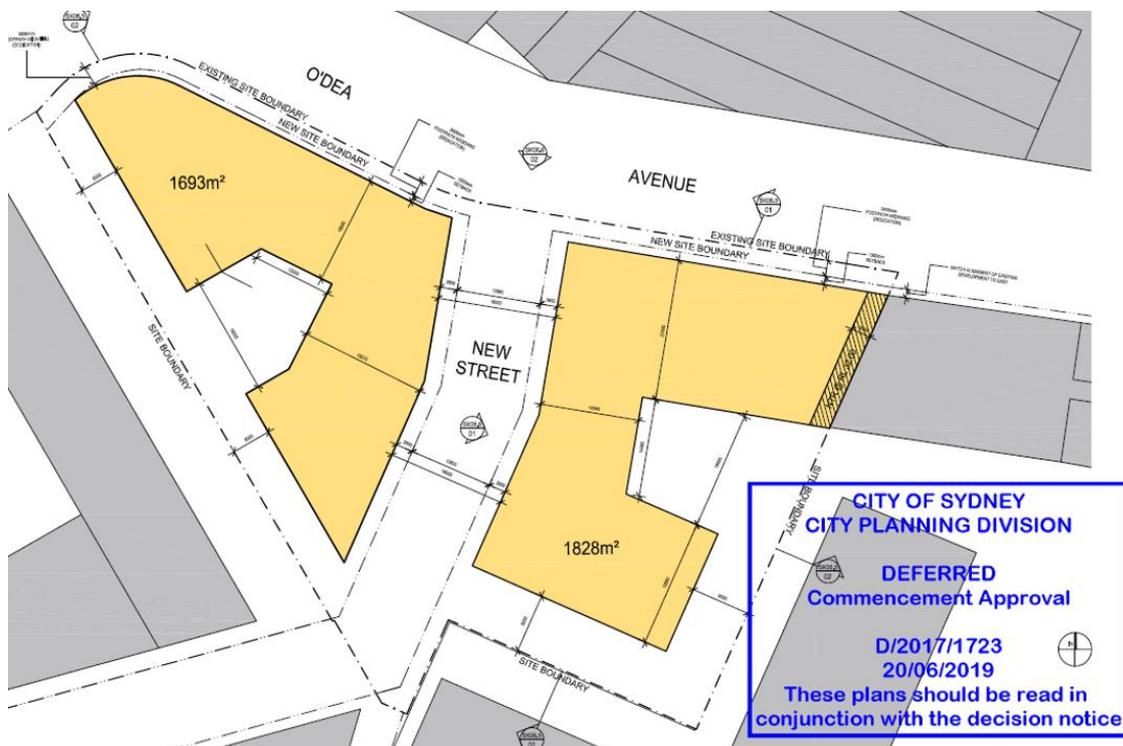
Approved envelope levels ground, 1, 2 and 3 floor plan
